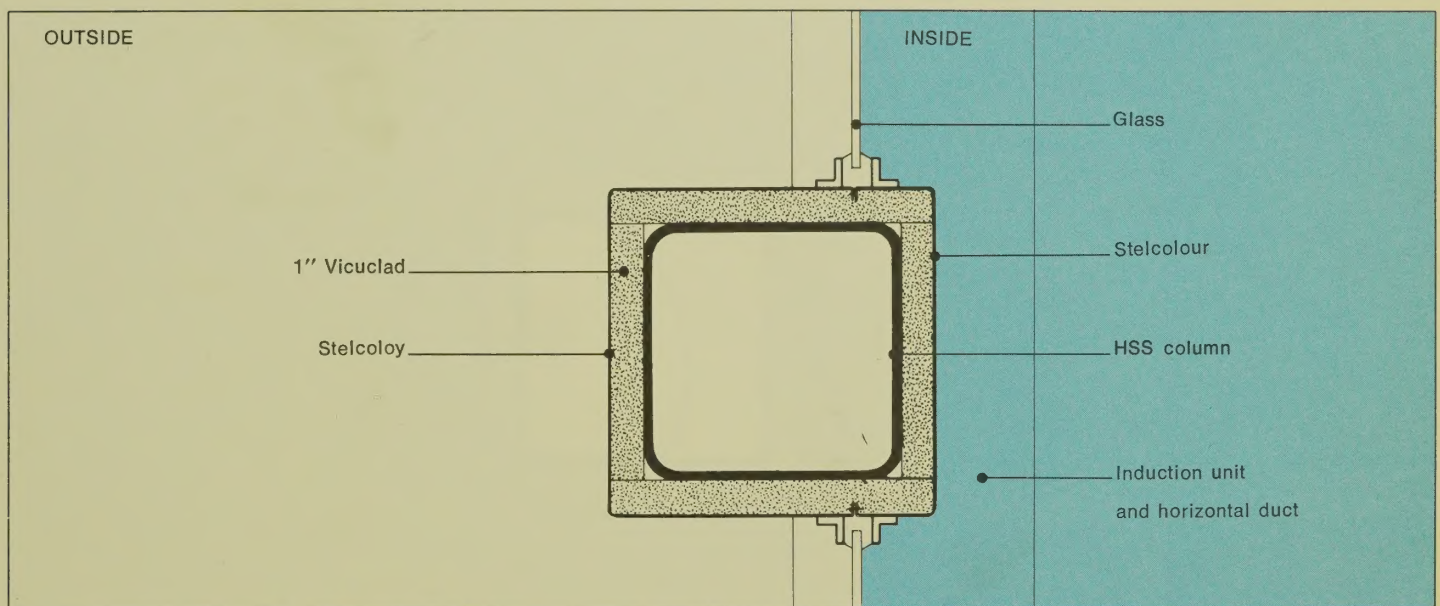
HSS columns at 10-foot centres projecting outside of the glass line of the exterior wall, with a horizontal duct system supplied from the central core for each floor.
